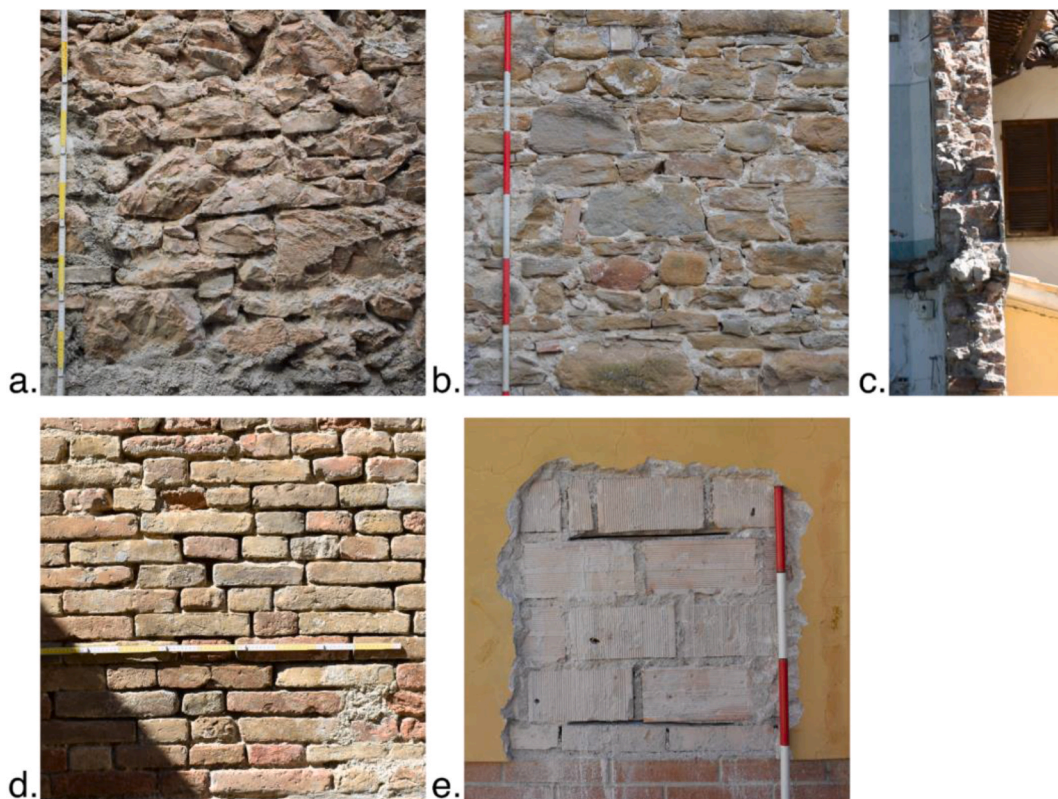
Examples of masonry types: a) and b) random rubble masonry; c) typical stonework cross-section; d) solid clay bricks; e) hollow clay blocks.
